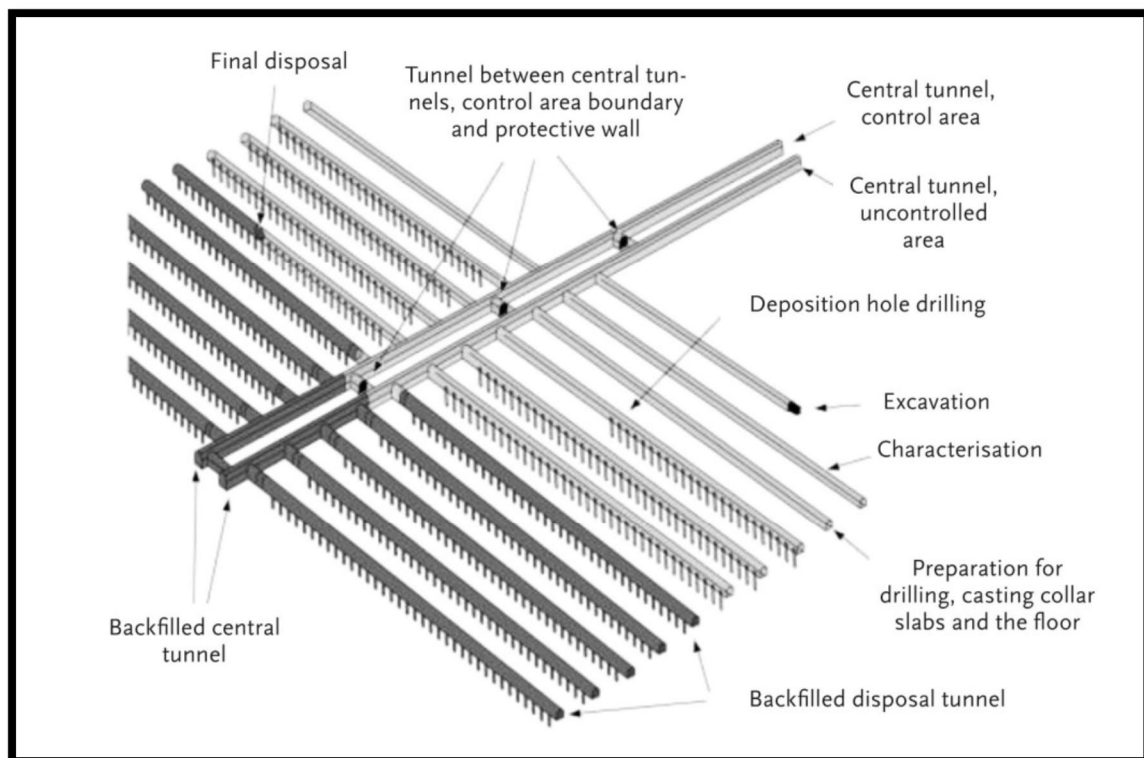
Construction detail of the deposition tunnels underground (Posiva 2010, p.26).
